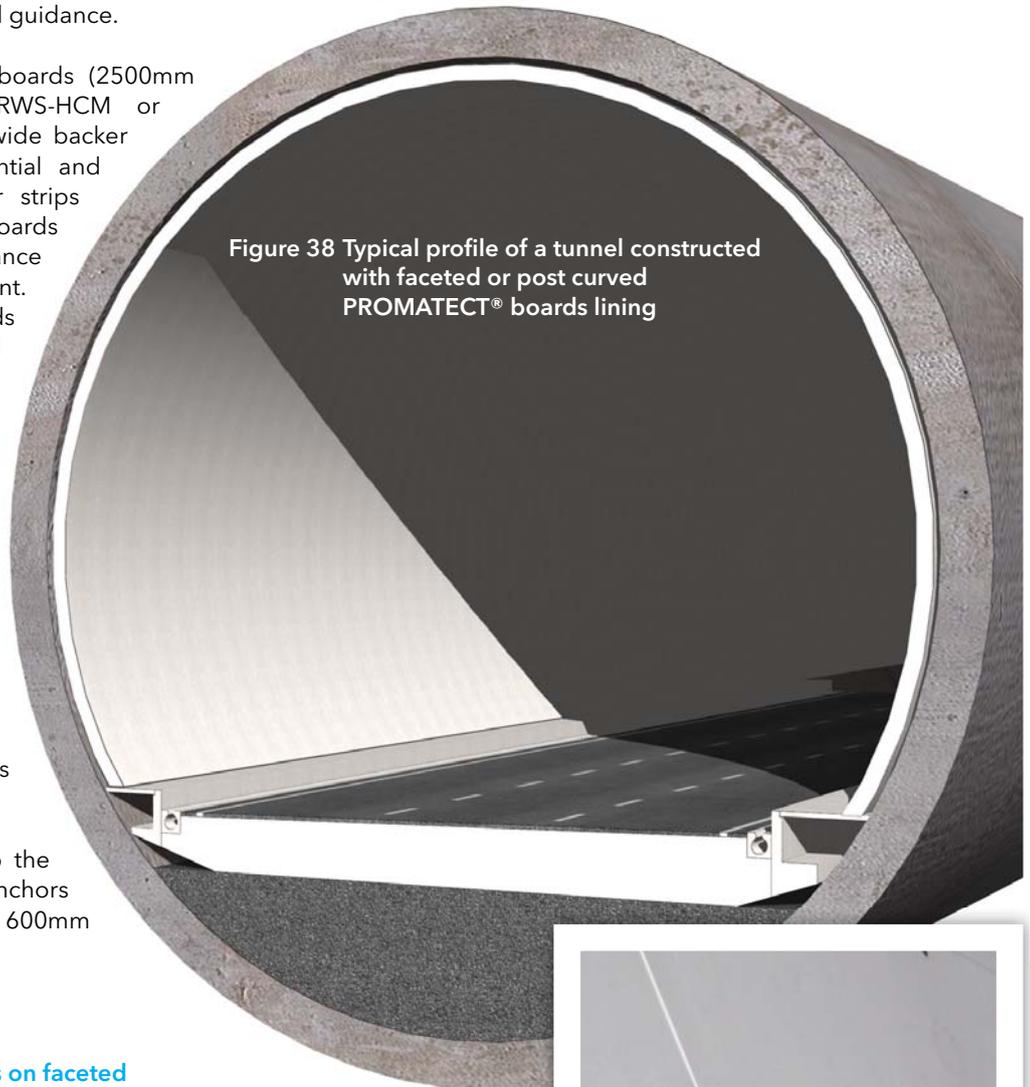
Typical profile of a tunnel constructed with faceted or post curved PROMATECT® boards lining
